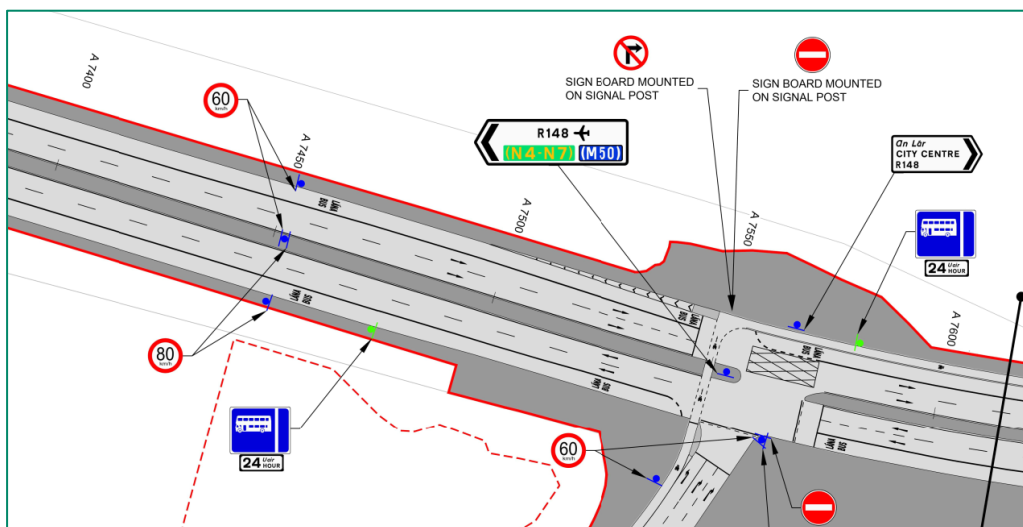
Extract of Traffic Signs and Road Markings drawings at the Con Colbert Road junction (Sheet 25)
